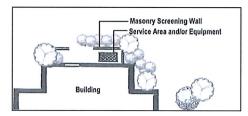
Landscaped, Masonry Screening Wall Along Public Rights-of-Way and Access Driveways.
